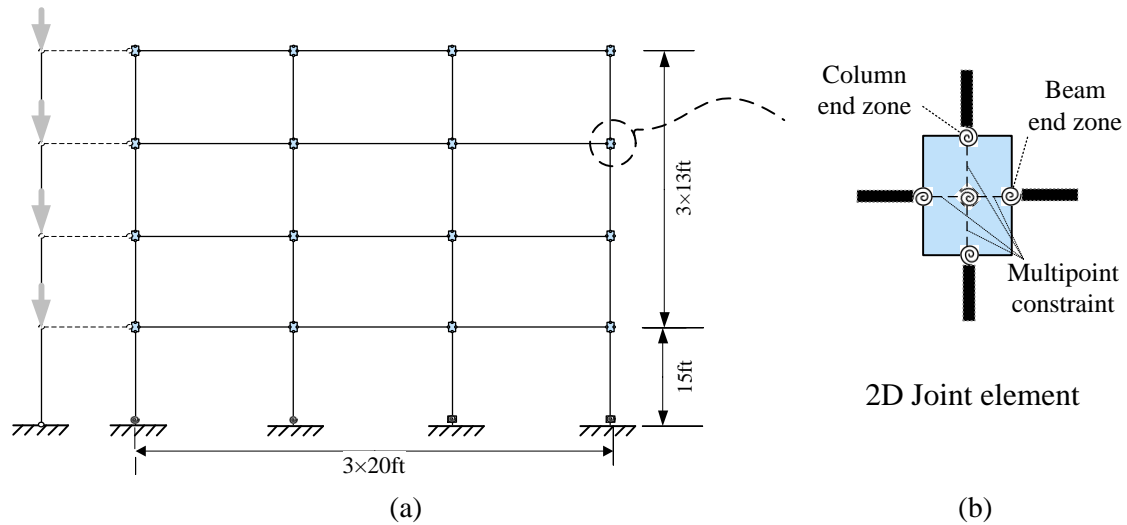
a) schematic of the 4-st SMF models and b) 2D joint element
